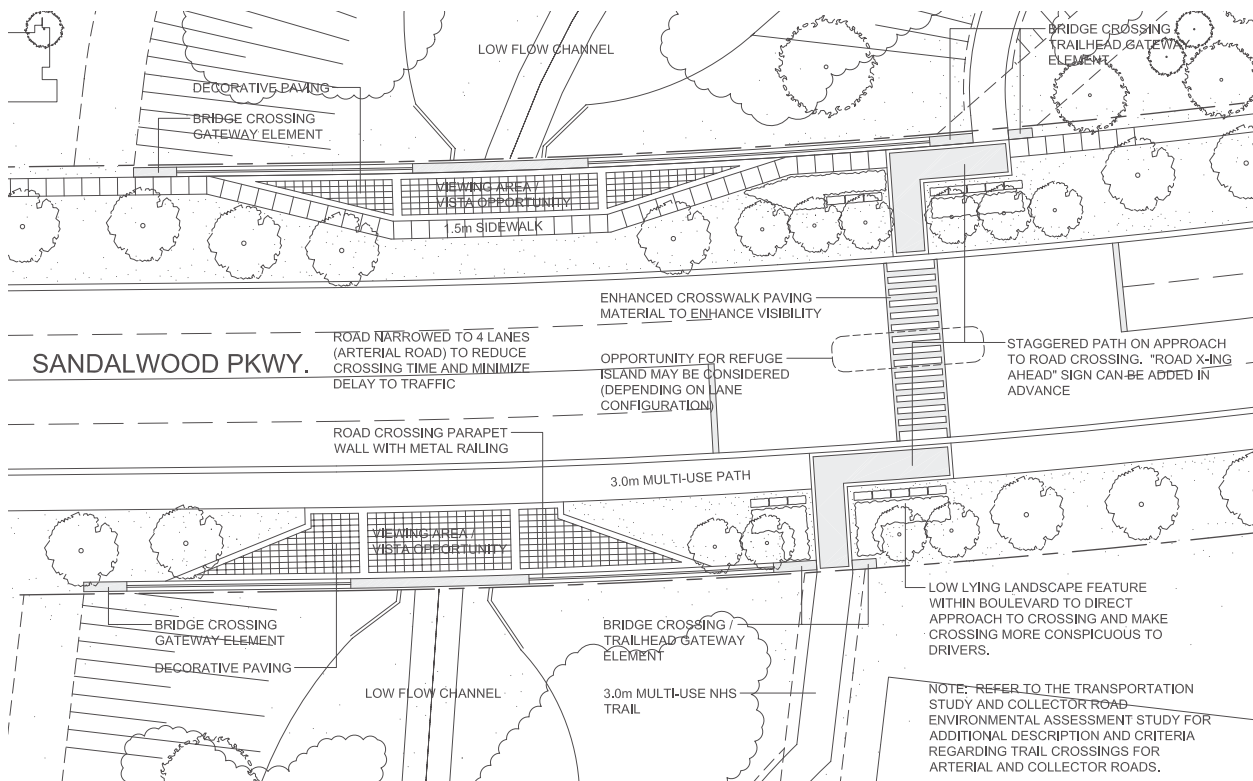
Conceptual plan option of typical trail crossing treatment for arterial and collector roads, as well as bridge crossing treatment and viewing opportunity. Crossing safety measures to be confirmed by the City of Brampton prior to installation.
